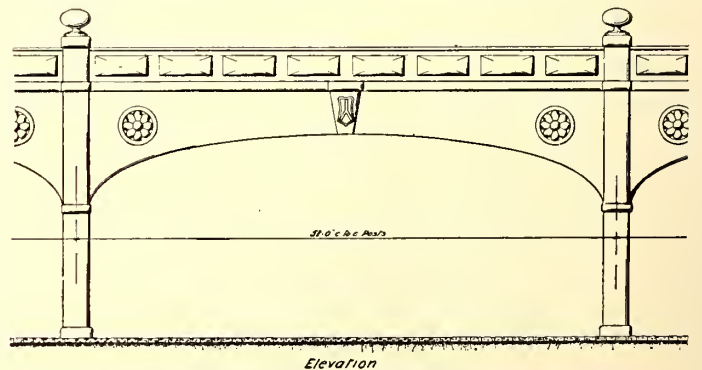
ELEVATION OF SUGGESTED CONCRETE STRUCTURE
